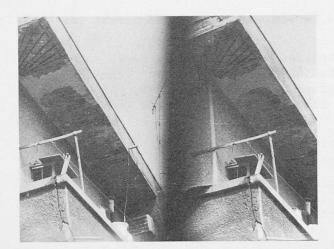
Structure 1 showing concrete spalling due to rebar corrosion
